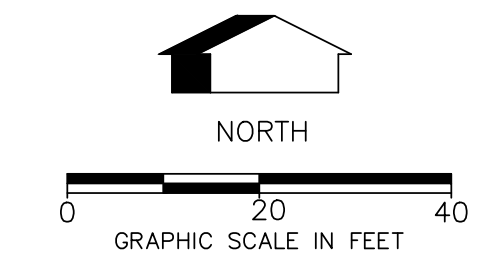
\300\18-347\Engineering\02 Site Plan.dwg
